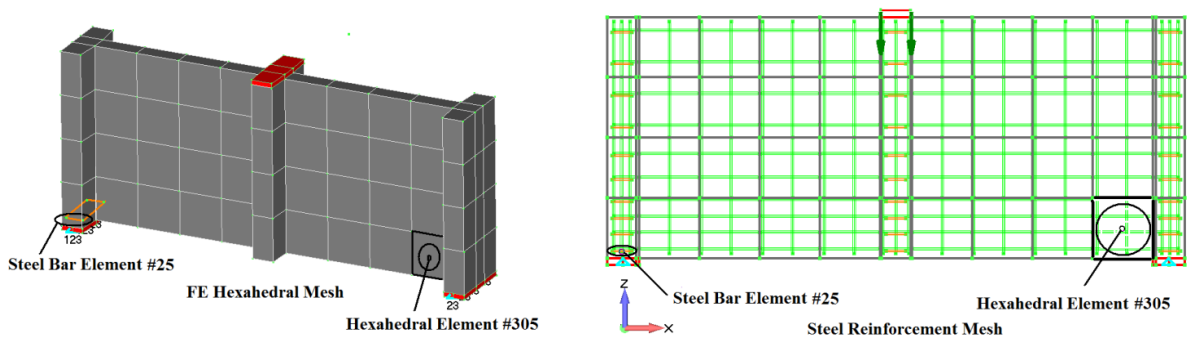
CONCRETE FE MESH AND STEEL REINFORCEMENT REBARS OF A SHEAR WALL.
